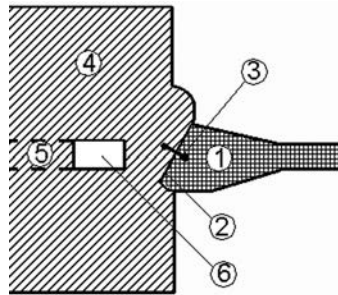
Joint of the asphaltic concrete core and the lateral wall, Legadadi dam (Ethiopia). (1) Asphaltic concrete core; (2) asphalt mastic; (3) rubber waterstop; (4) concrete buttress; (5) control gallery; (6) control manhole.
